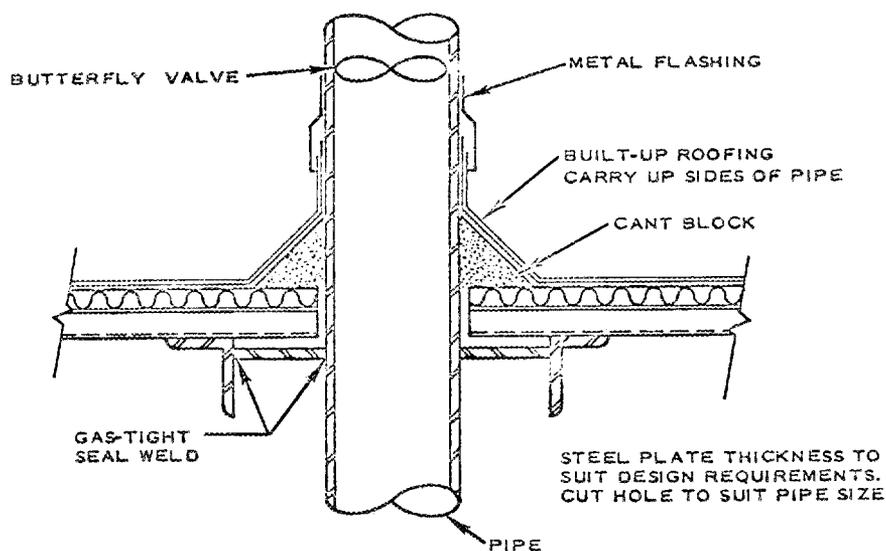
Piping Penetration Through Metal Deck Roof. (From ref. 2)
